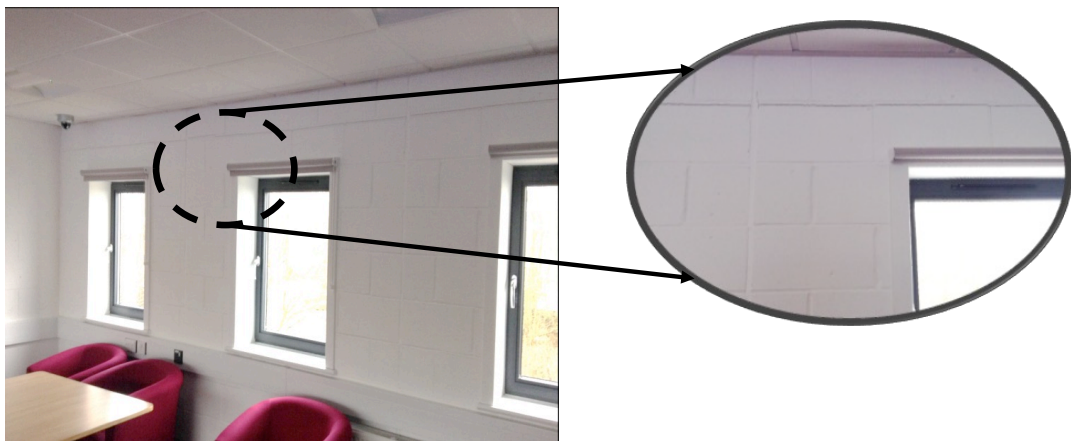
Crack on the external wall (main-lounge)
